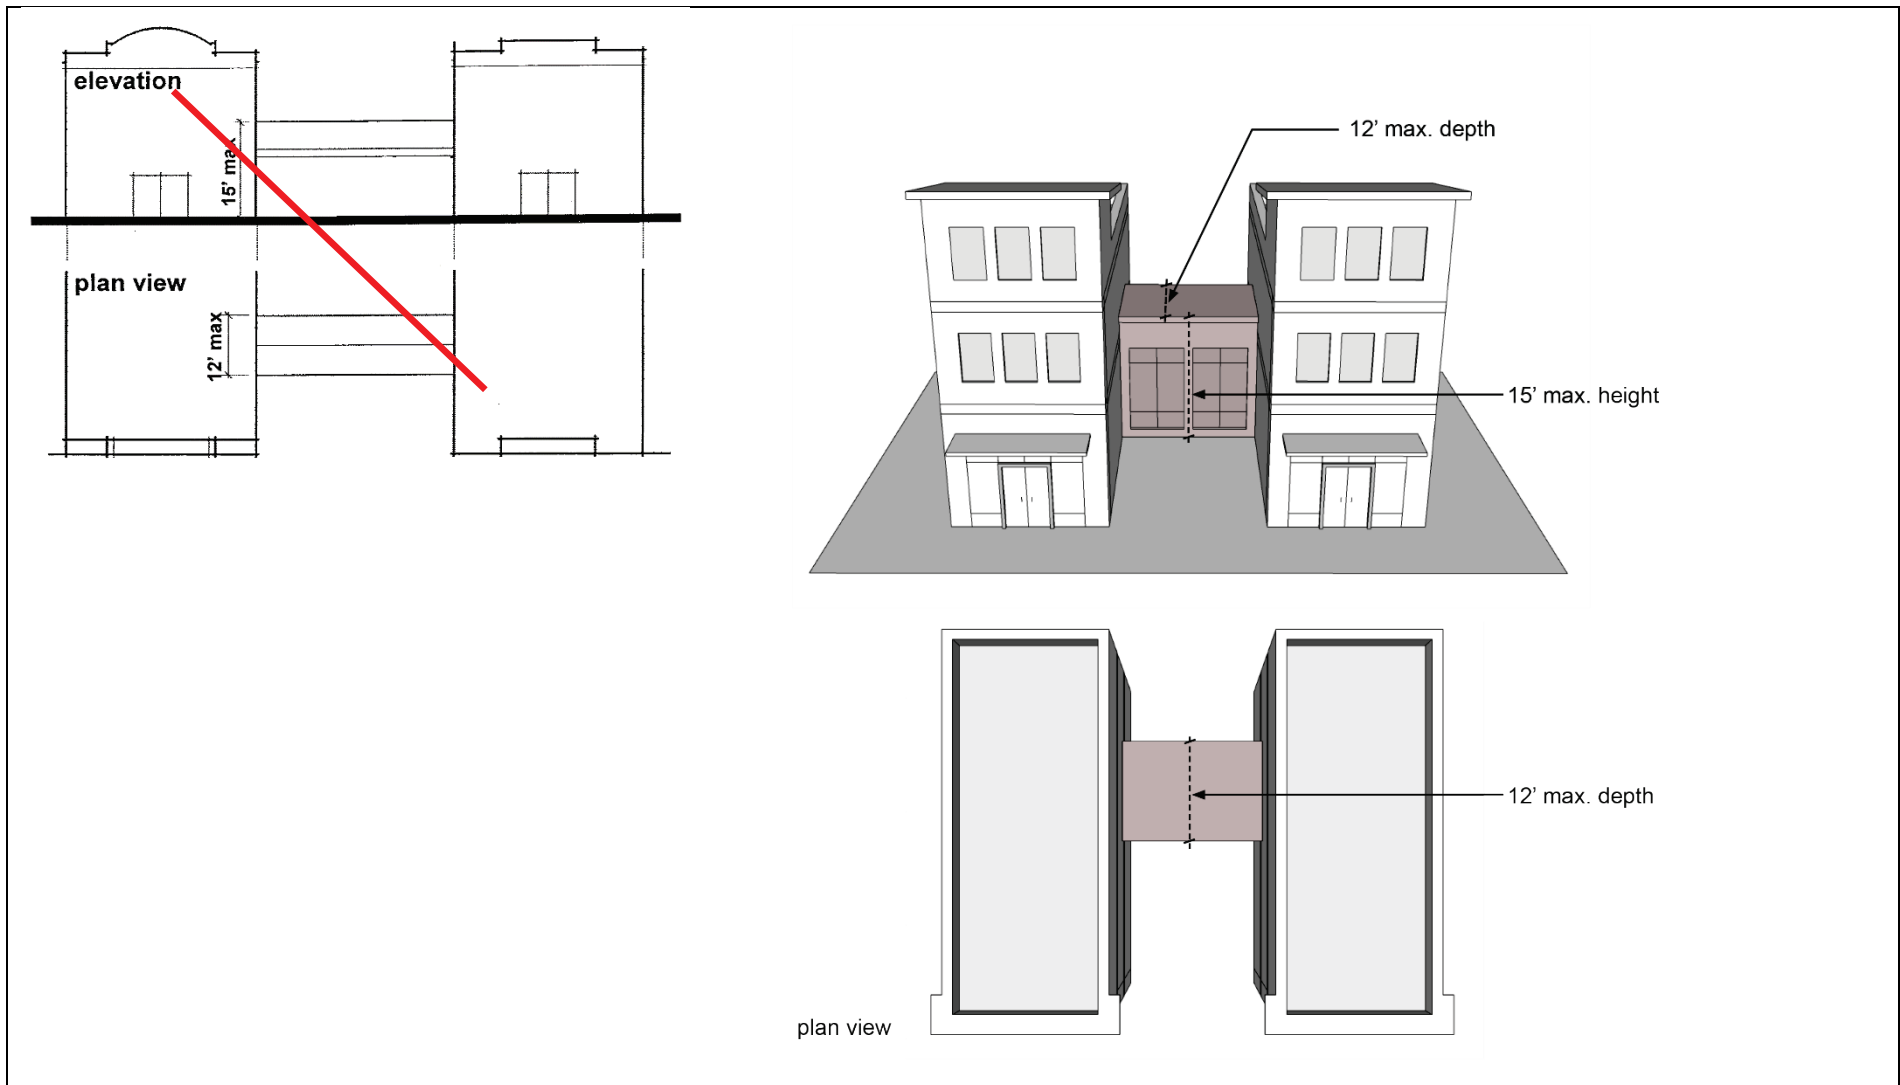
Pedestrian or Breezeway At-Grade Open or Enclosed Connection
